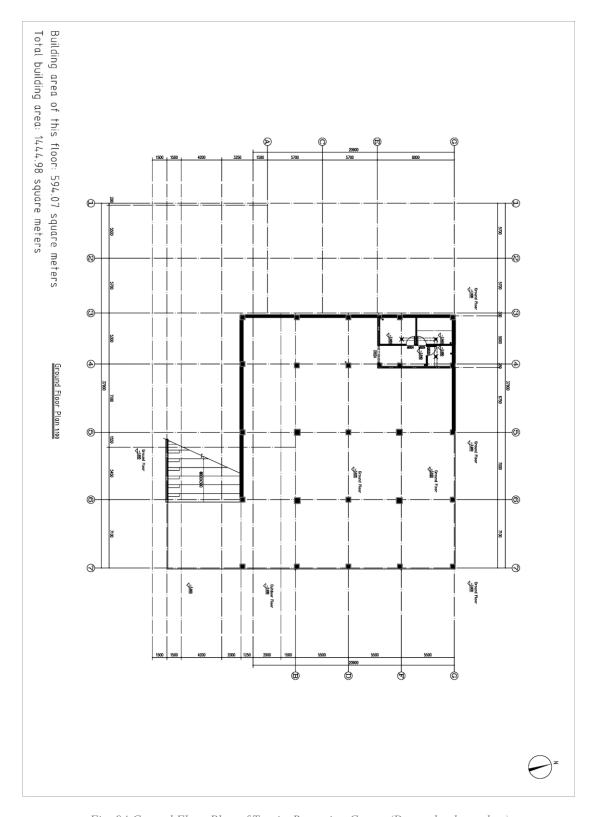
Ground Floor Plan of Tourist Reception Center (Drawn by the author)
